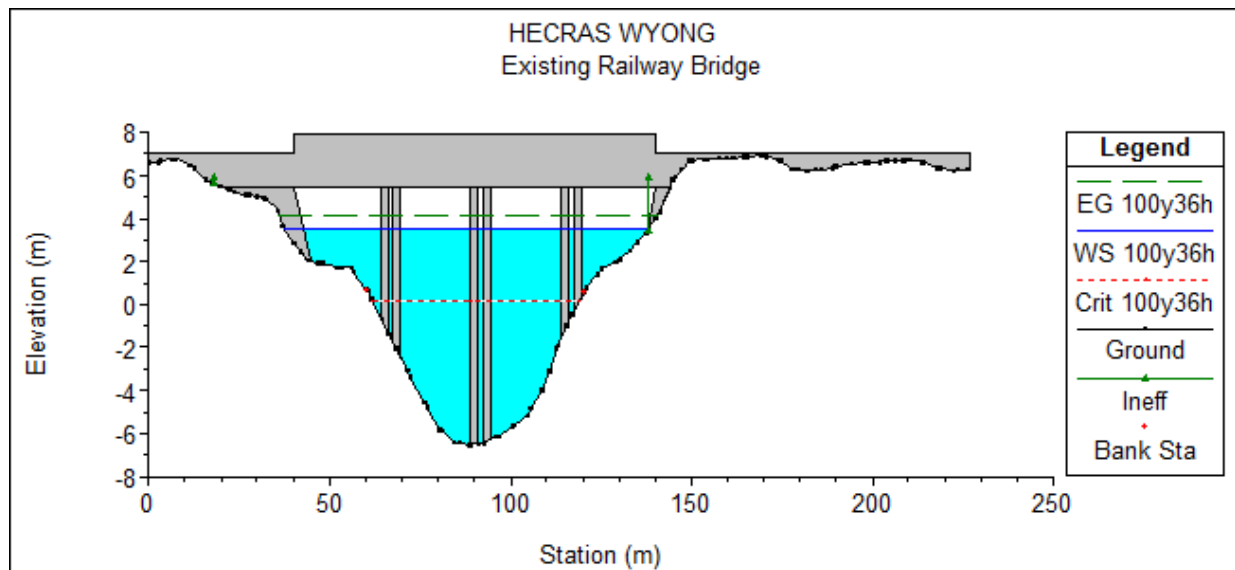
HEC-RAS cross-section at existing Main North Line railway bridge over Wyong River (River Station 275.00)
